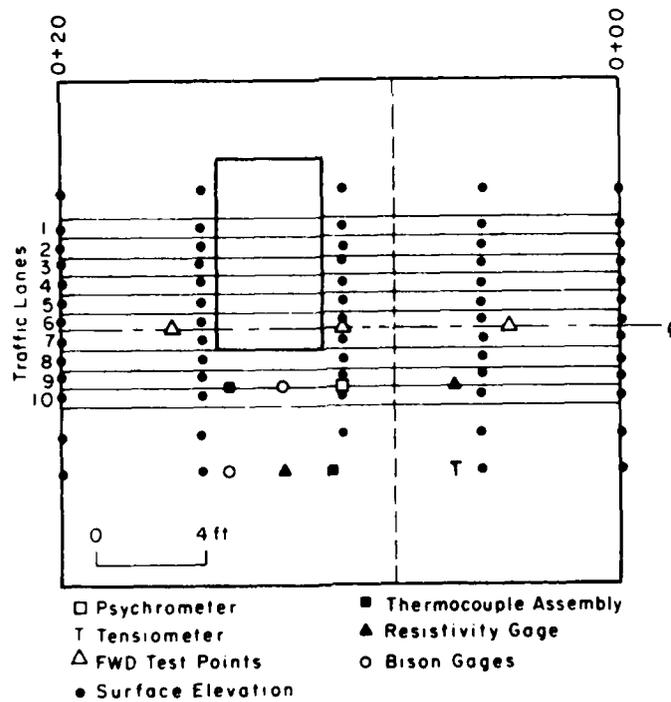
Layout of Instrumentation and Test Pit in the Test Sections.
